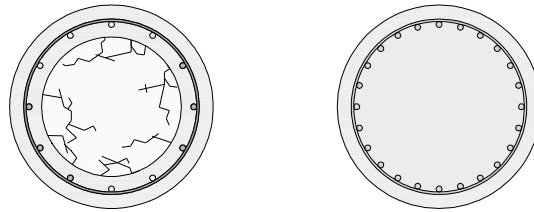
Piers cross section: (a) repaired squat pier, (b) as-build tall pier
